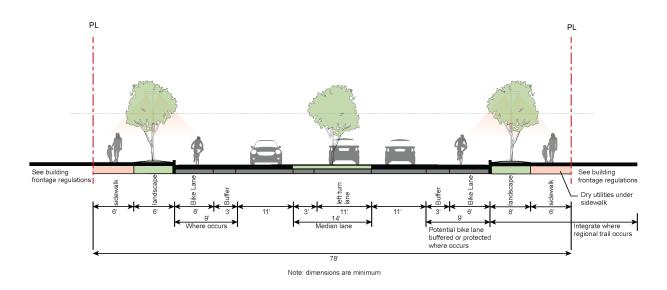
Development Internal Street with On-Street Bicycle Facility Standards
